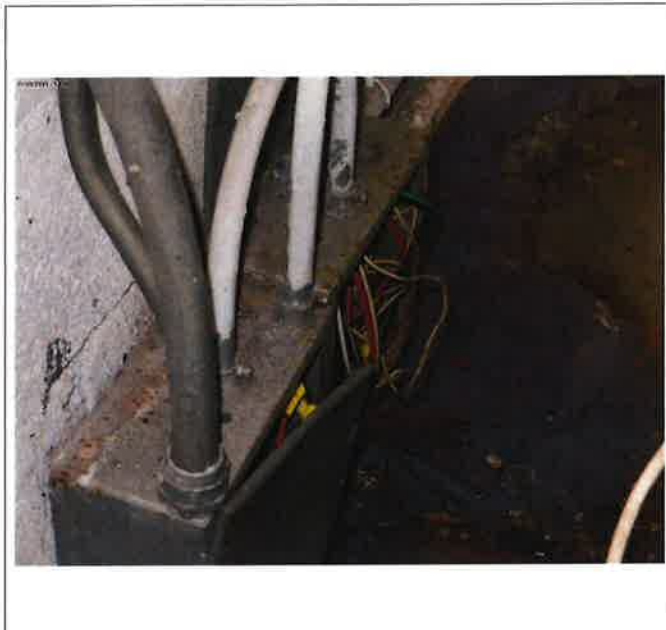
Outside Air Unit 3N room: gutter missing cover.
